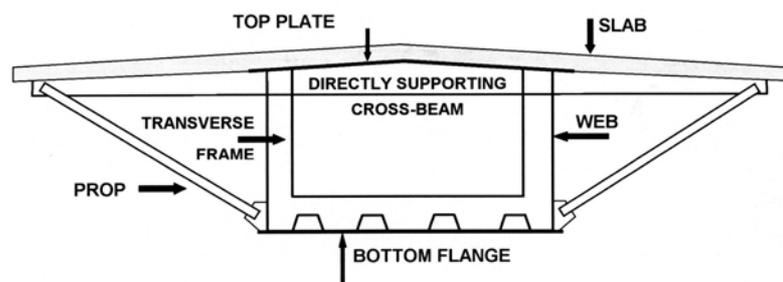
Box girder with directly supporting cross-beams and propped cantilevers (pavement bidirectional banking)
